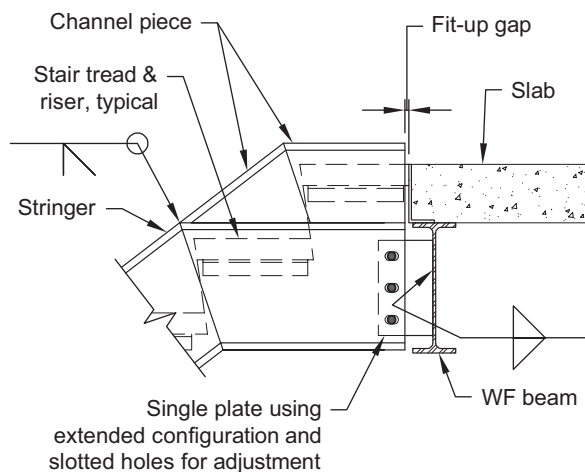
Stair stringer with single-plate connection using extended configuration.
